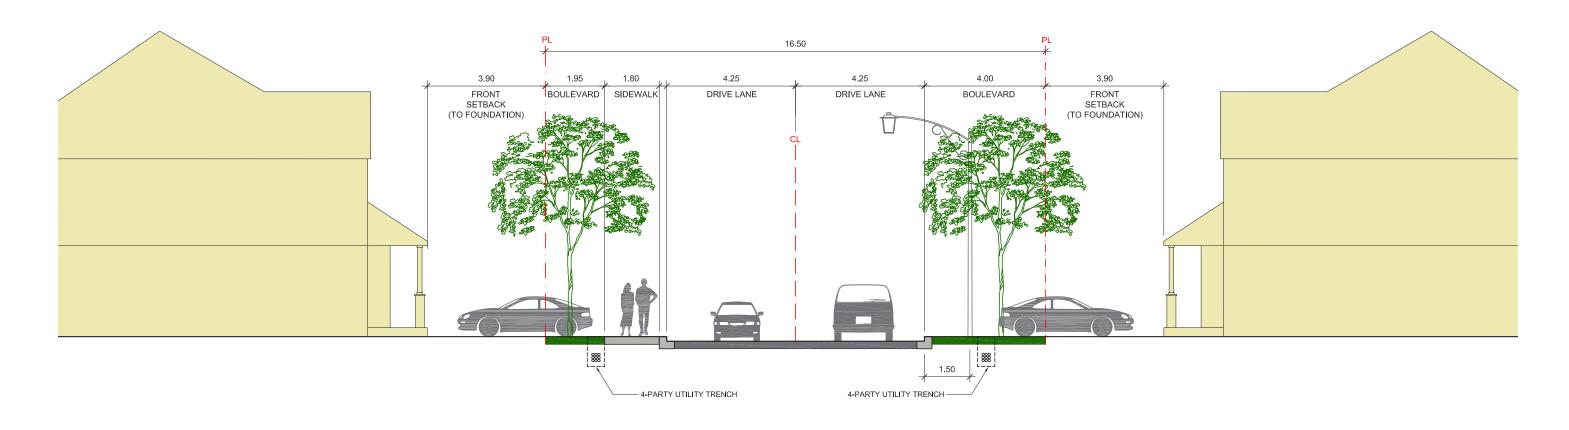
Local Road (Typical 16.5m ROW - Area 2)
